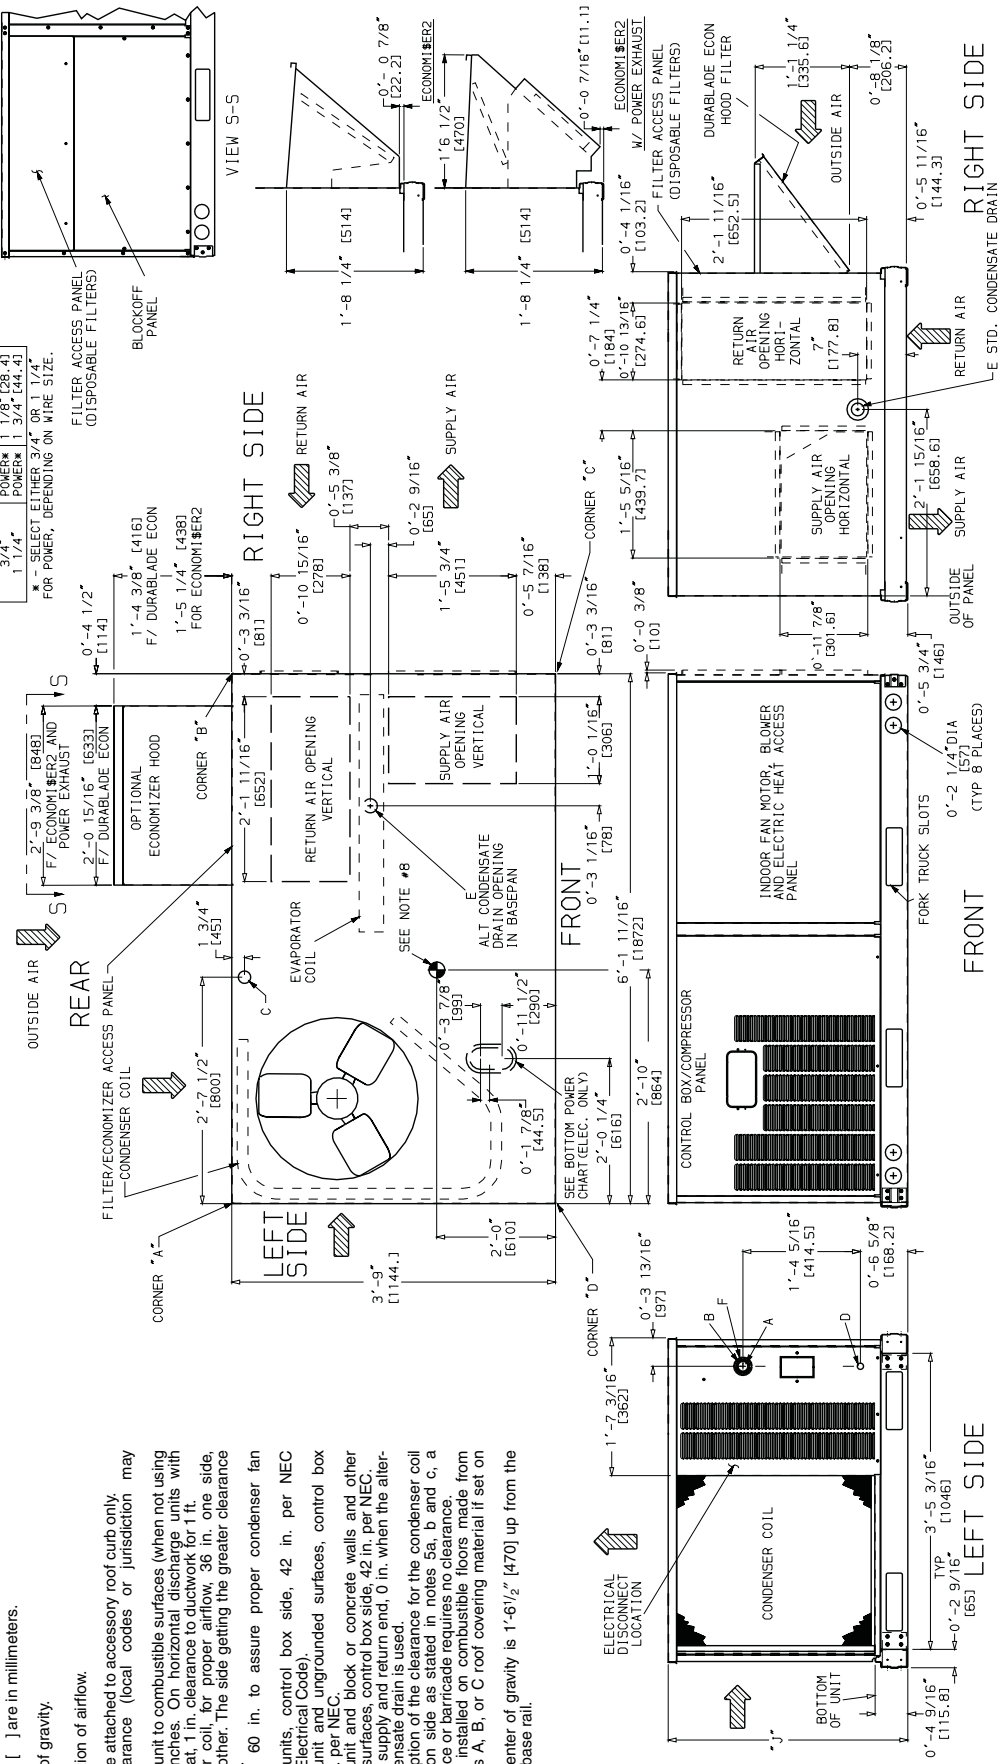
B — Base Unit Dimensions — 50TM007 Units
